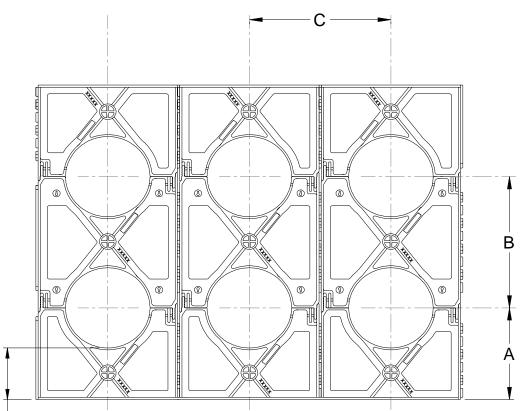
FIGURE A - PLAN VIEW TYPICAL DISTRIBUTION CONDUIT CONSTRUCTION DETAILS
